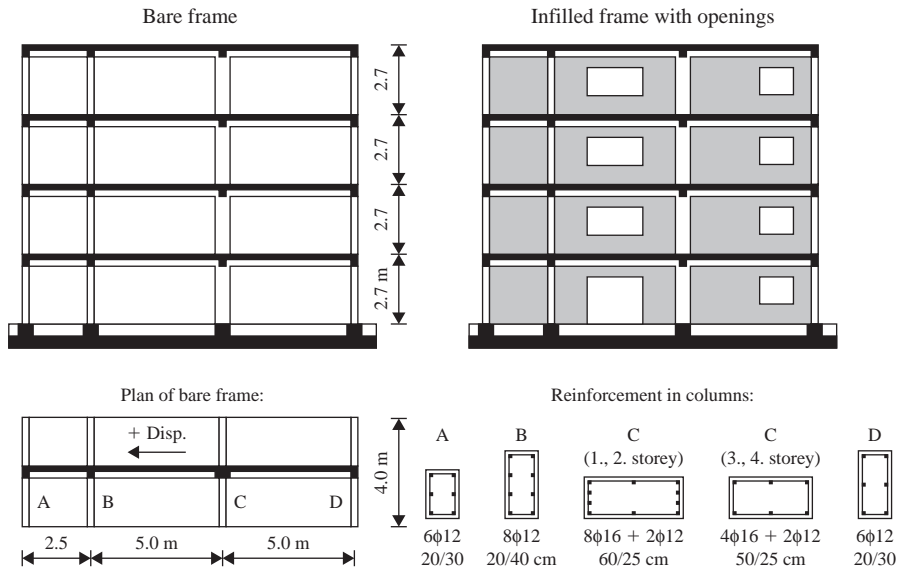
The view, the plan and the typical reinforcement in the columns of the test building.
